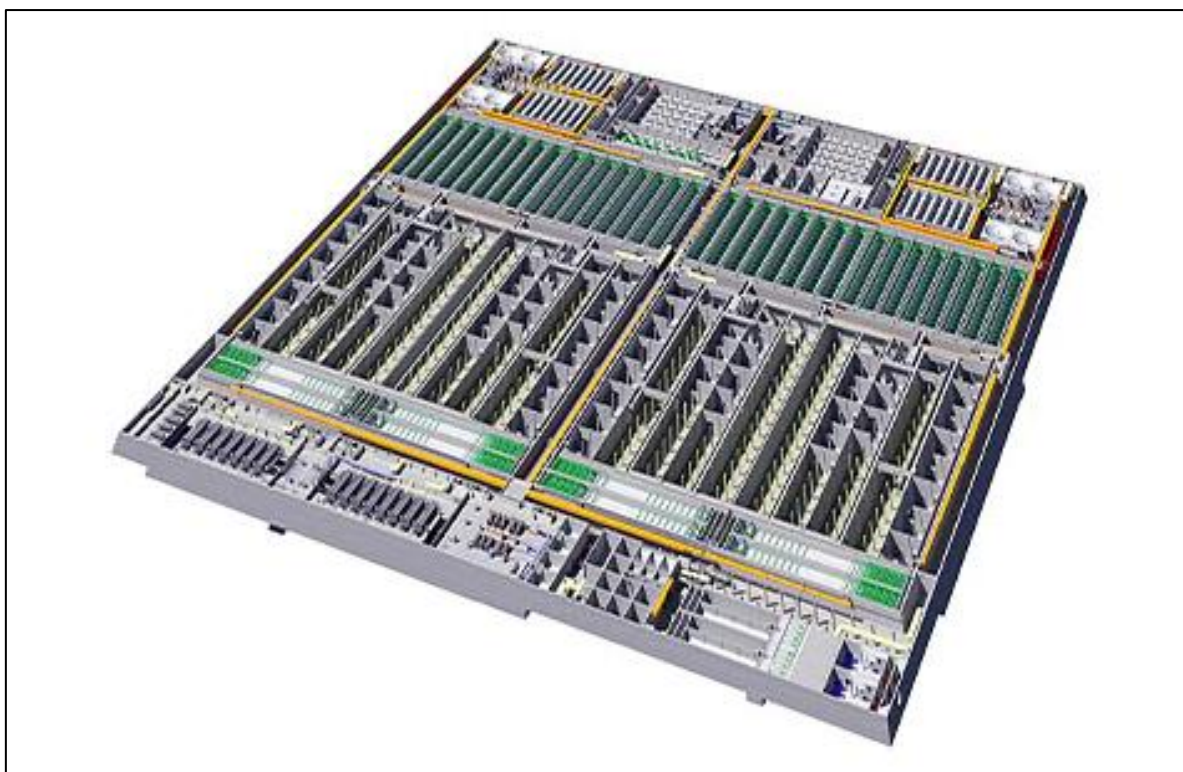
A Rational Layout Underground of Shanghai Taihe WWTP
